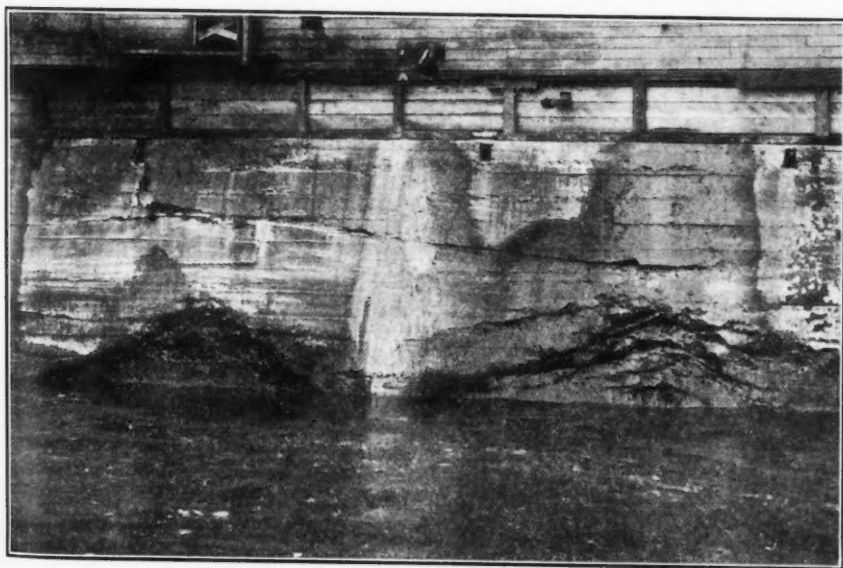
DETAIL OF OLD WATERFRONT WALL, SEATTLE, WASH., BUILT IN 1913
